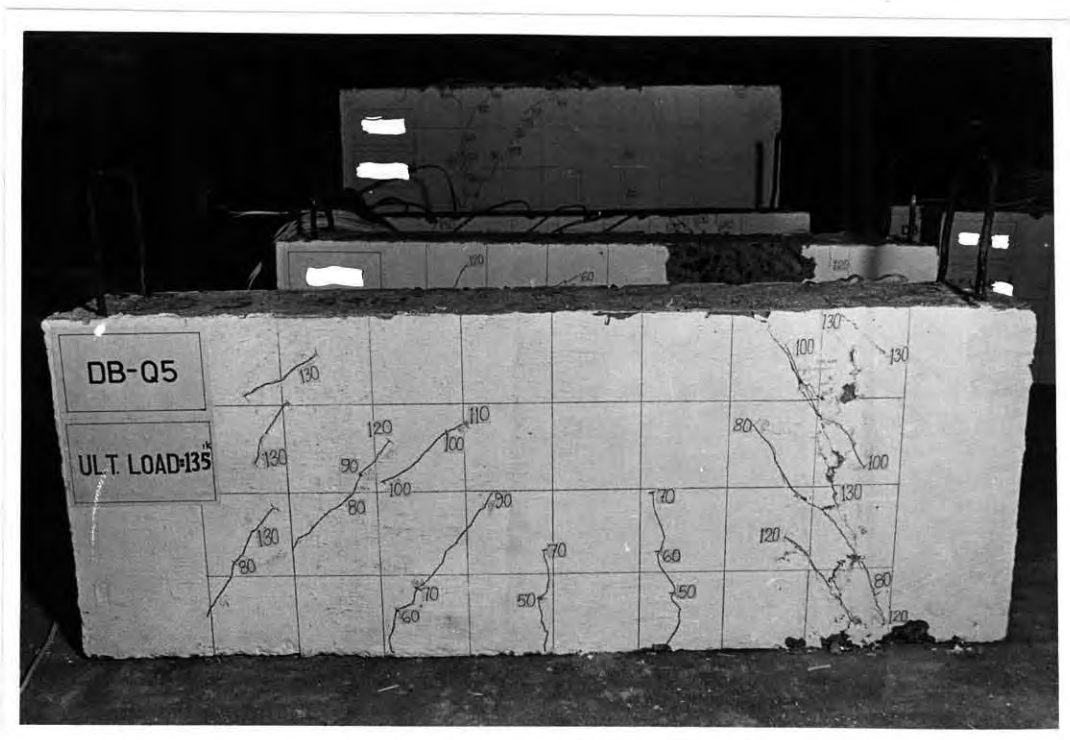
Mode of Failure and Crack Pattern of Beam DB-Q5
